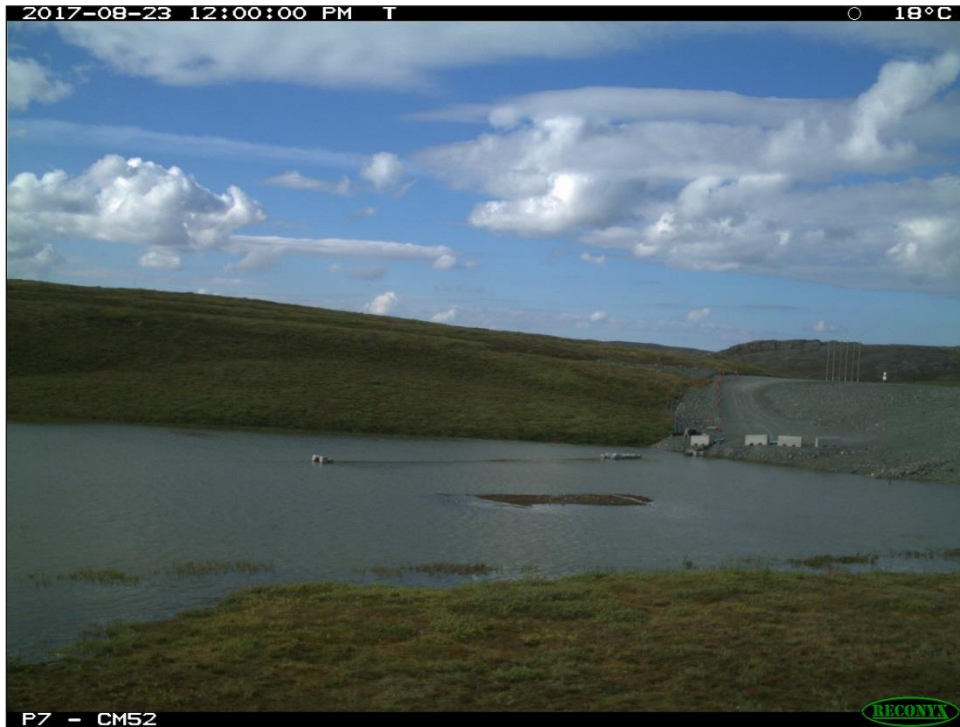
Example of the monitoring view of Camera 52 at the North Dam of the TIA, September 2017.
